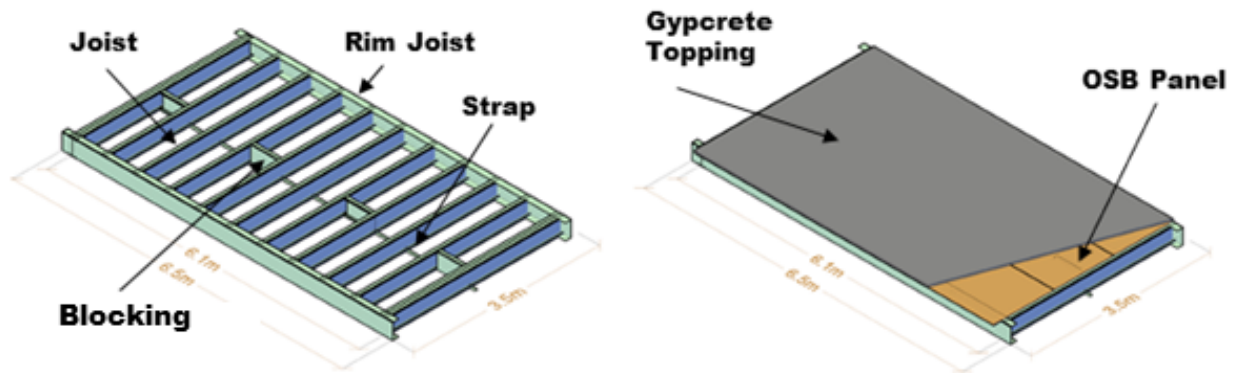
Bare Frame and Frame with Sheathing: Specimen 16-FCRETE-M
